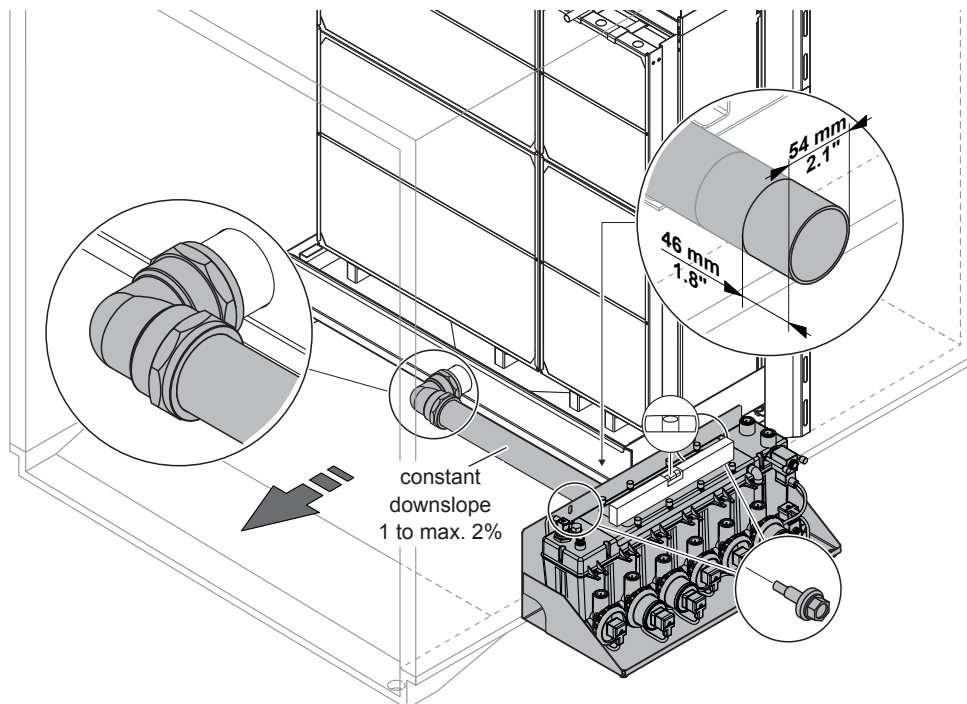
Mount the Hydraulic Module of ME Circulating System (internal installation)
